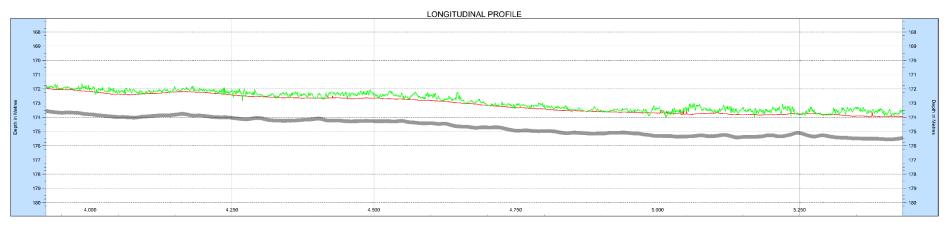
PL4556 As-built alignment sheet KP3.922 to KP5.432
